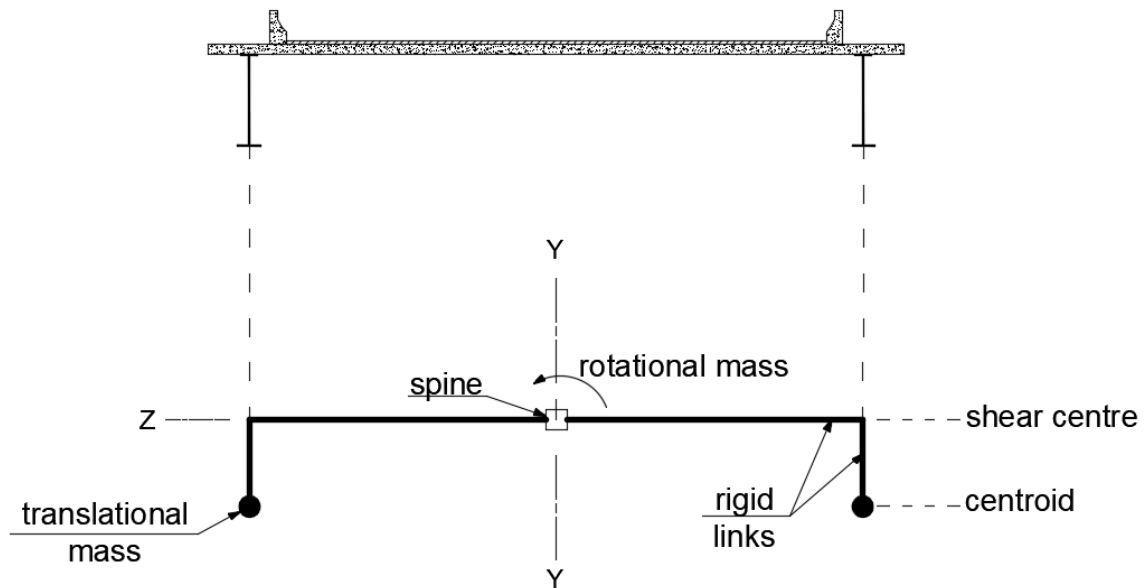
Finite element modelling of concrete-steel composite two I-girders deck according to Wilson *et al.* (1991).
